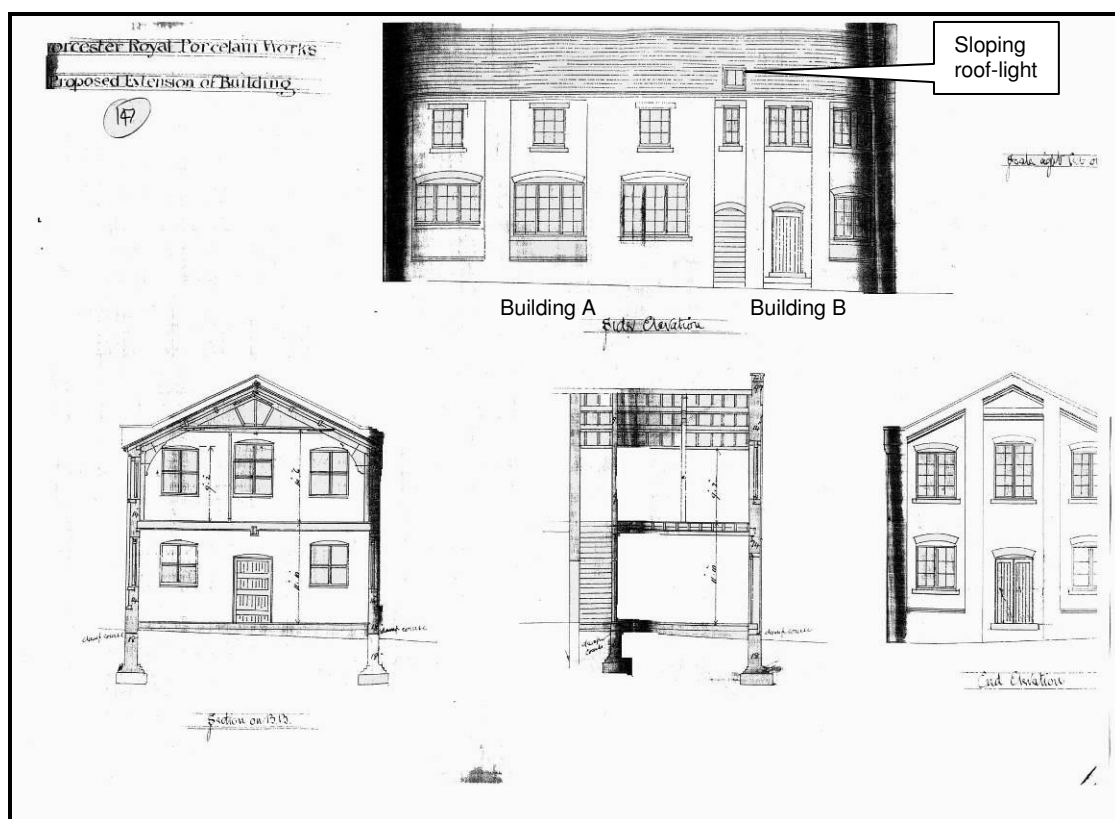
Proposed eastern extension of the Slip House (Building B) (Worcester City Planning Application 1437 23.1.1890)
